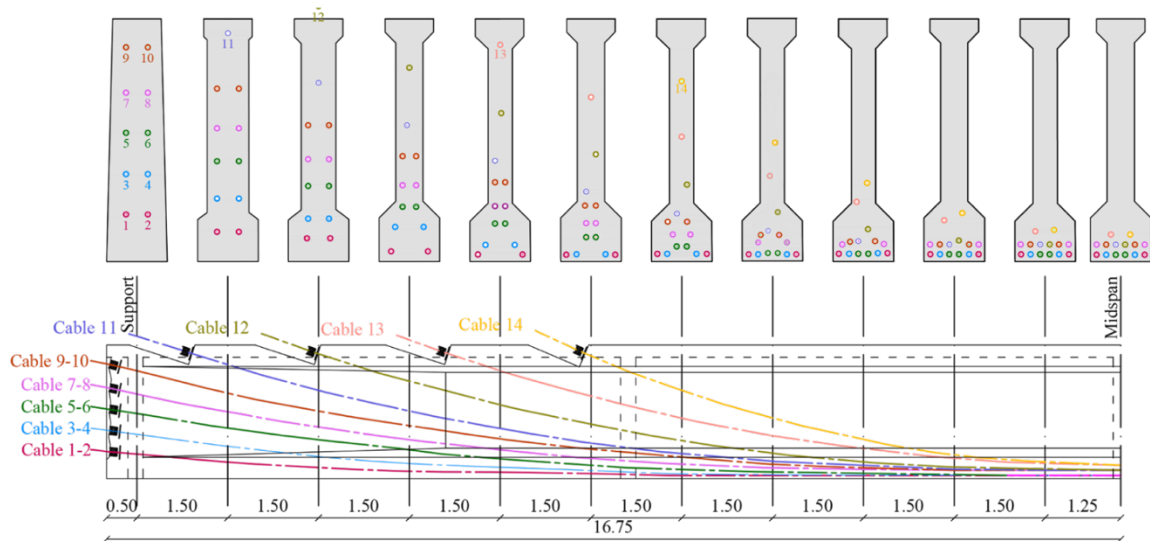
Longitudinal and transversal section of girders with post-tensioned cables
